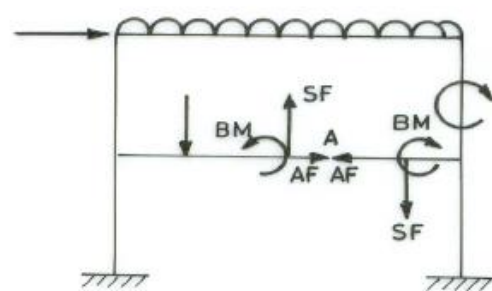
Internal Forces Developed At Section A Due To Applied Loading.
